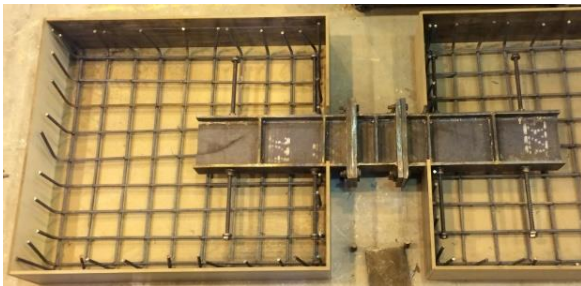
Coupling Beam Embedded into RC Shear Wall (All Front Steel Reinforcements are not shown)
